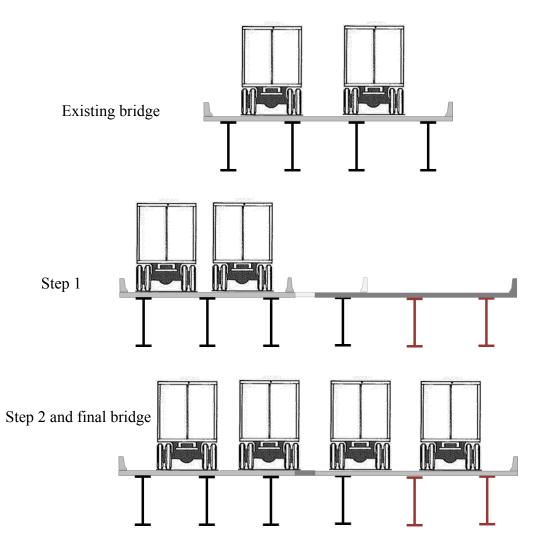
Typical construction sequences of a bridge replacement using phase construction approach
